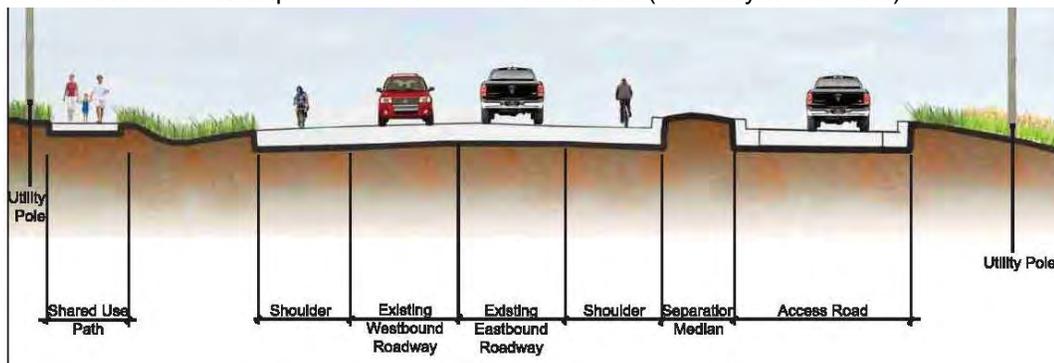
Alternative 2 Access Management Option Improvement Segment A Typical Section
